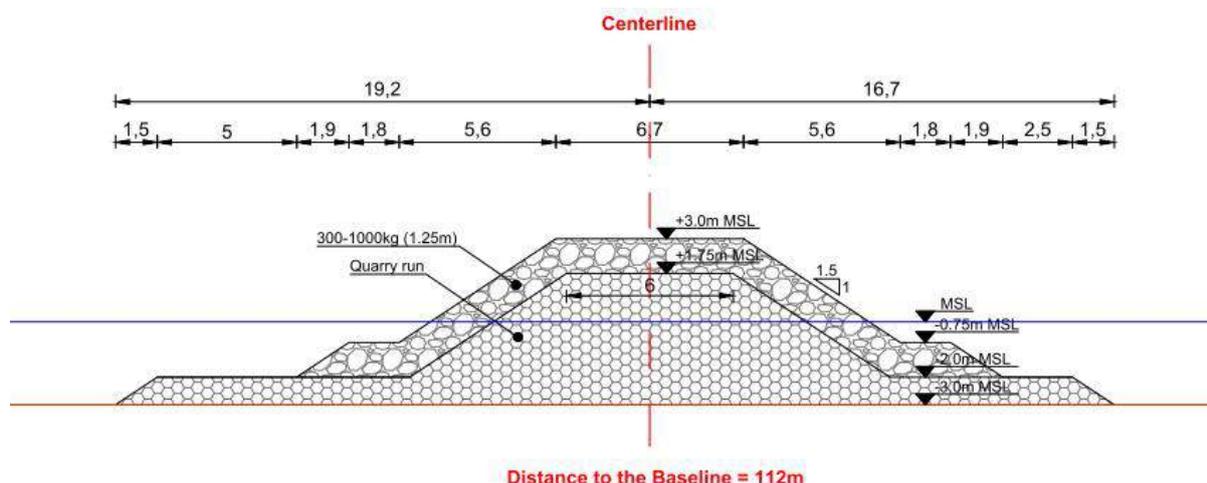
Principle cross-section West Point - groyne trunk D-D (Alternative B)
